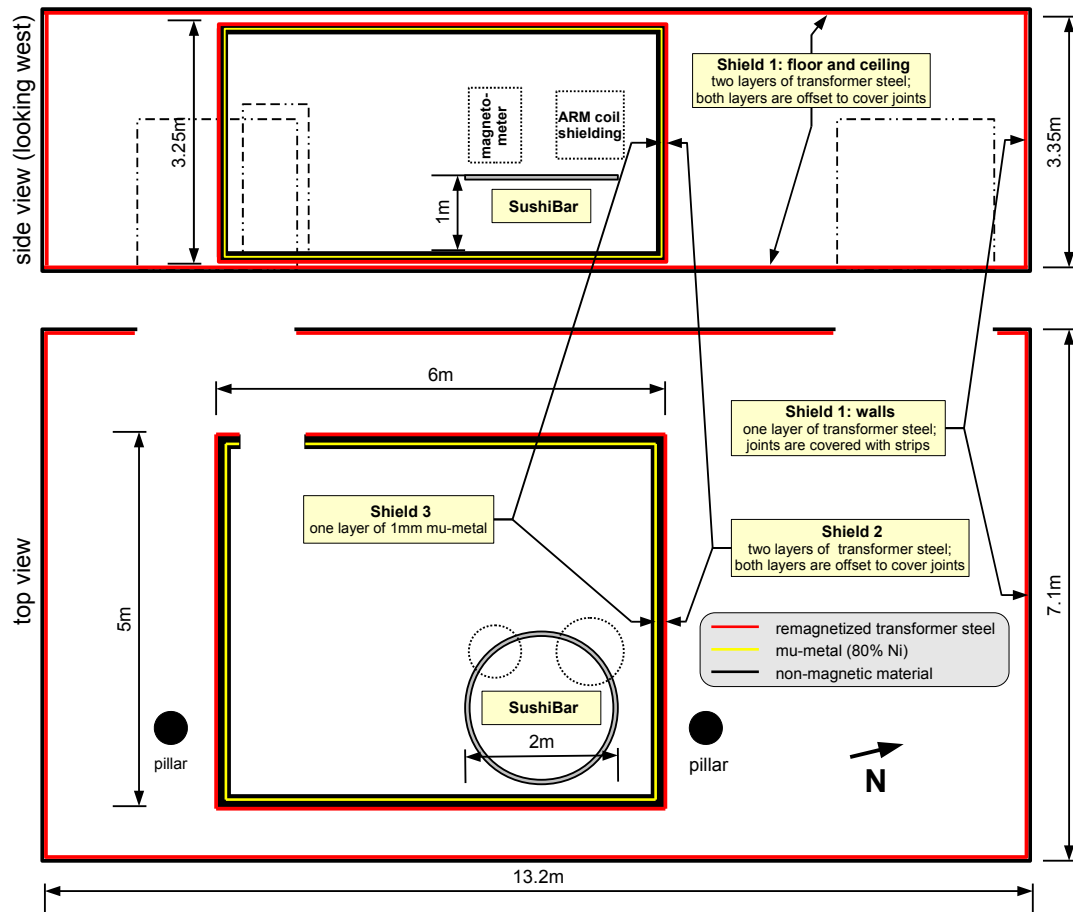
Layout of the magnetically shielded room. Dimensions and arrangement of different shielding layers as well as location and dimension of the automated measurement system 'SushiBar' are shown. Pillars are made of concrete and part of the structure of the building.
